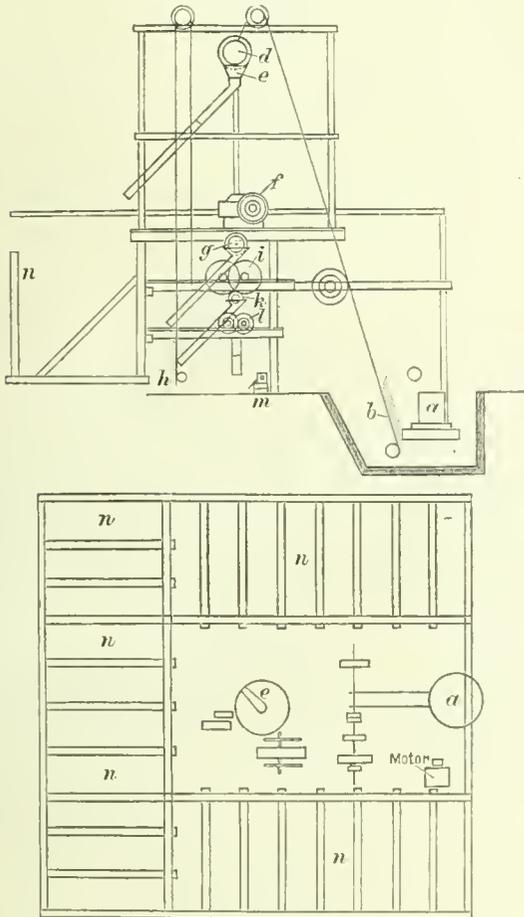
PLAN AND ELEVATION OF SAMPLING MILL
